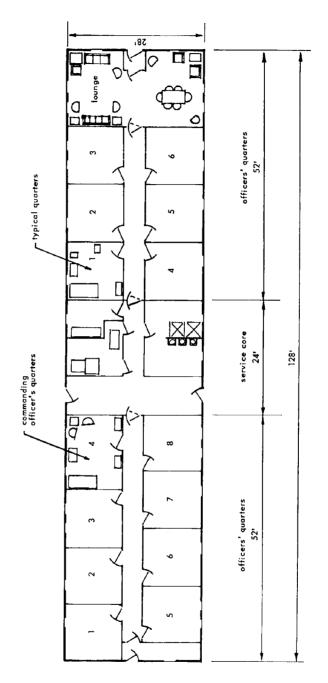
Building No. 7, officers' quarters — quarters floorplan.
